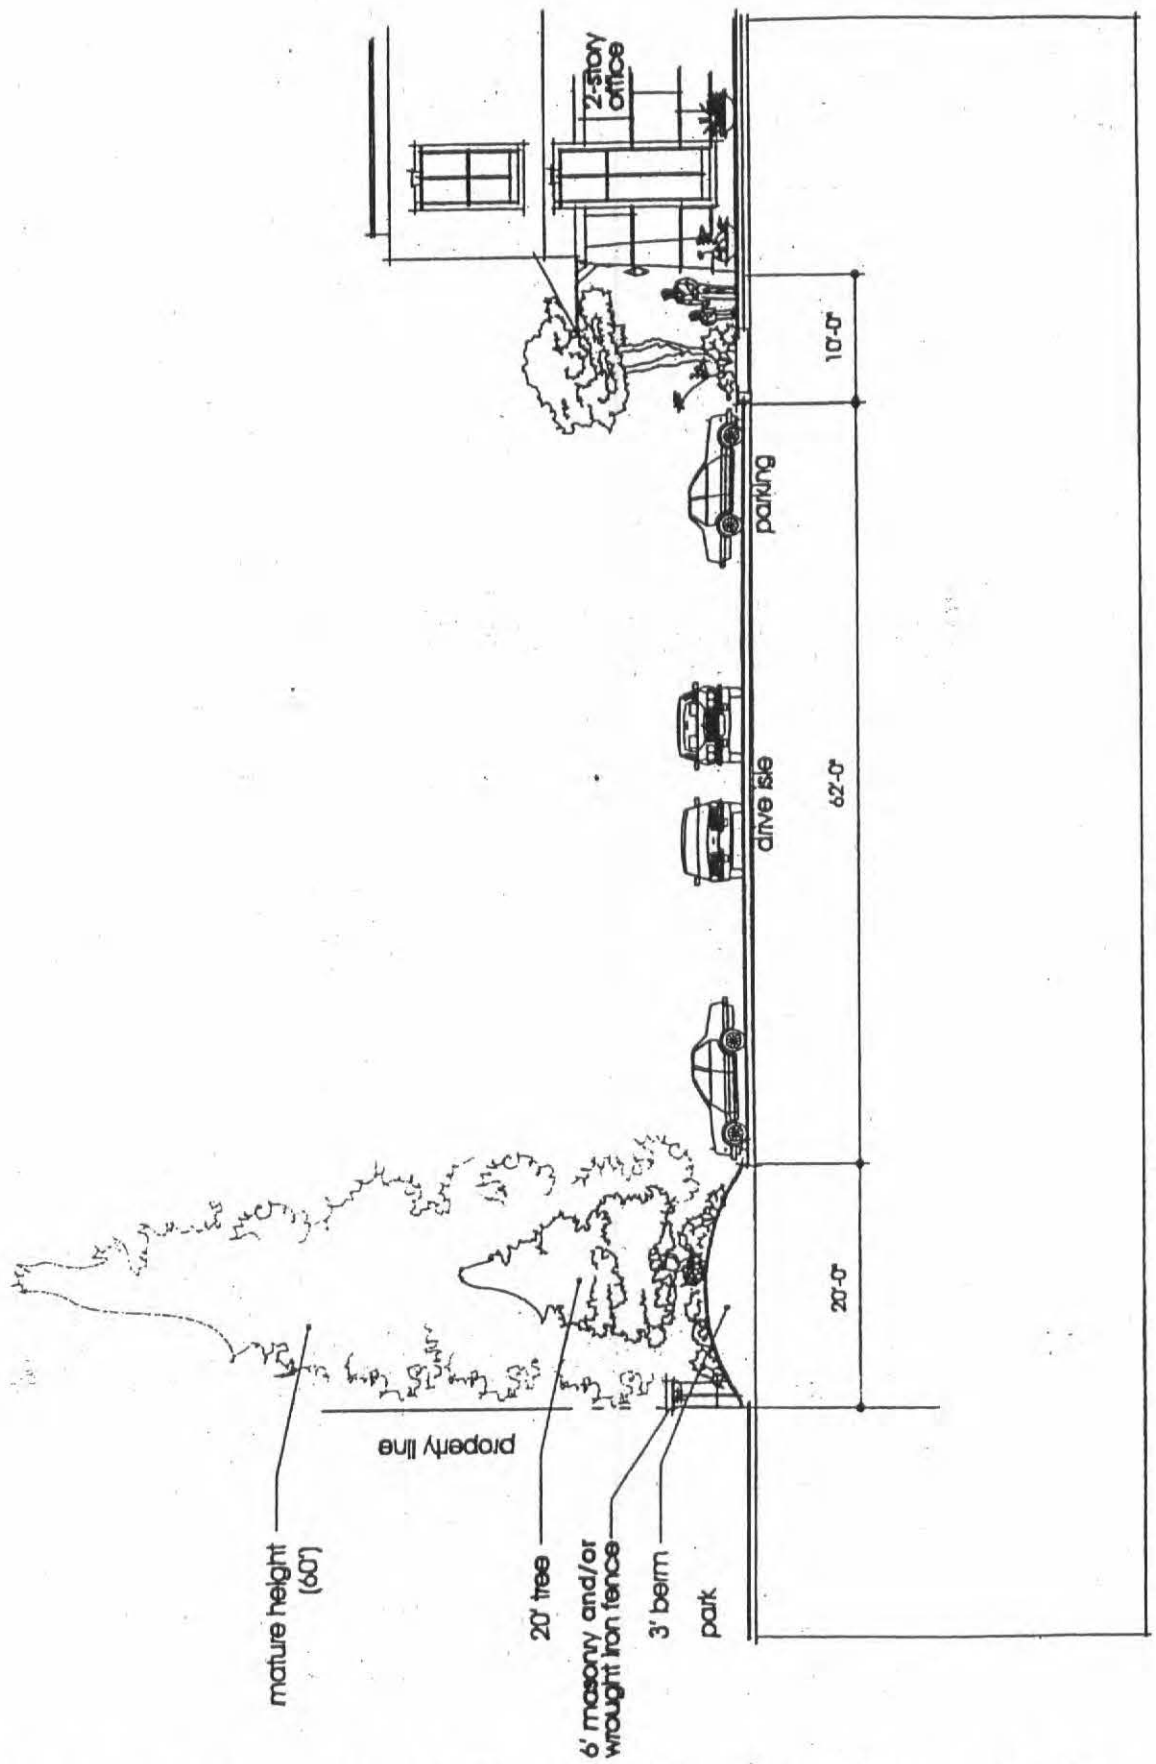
Section Through West End of Property Adjacent to Park and Private Property
